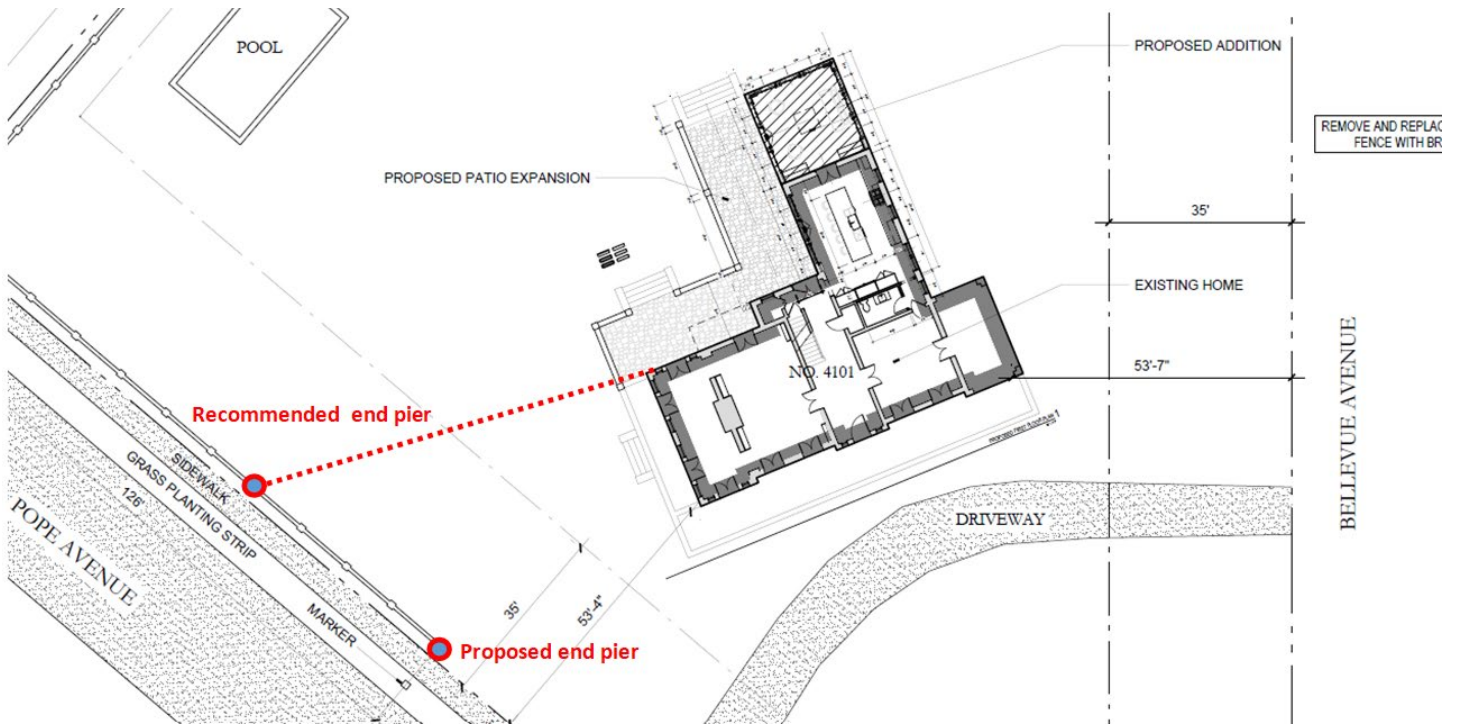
Recommended end pier to preserve views of side yard and side elevation of building. Recommended to remove last four panels of brick wall.
